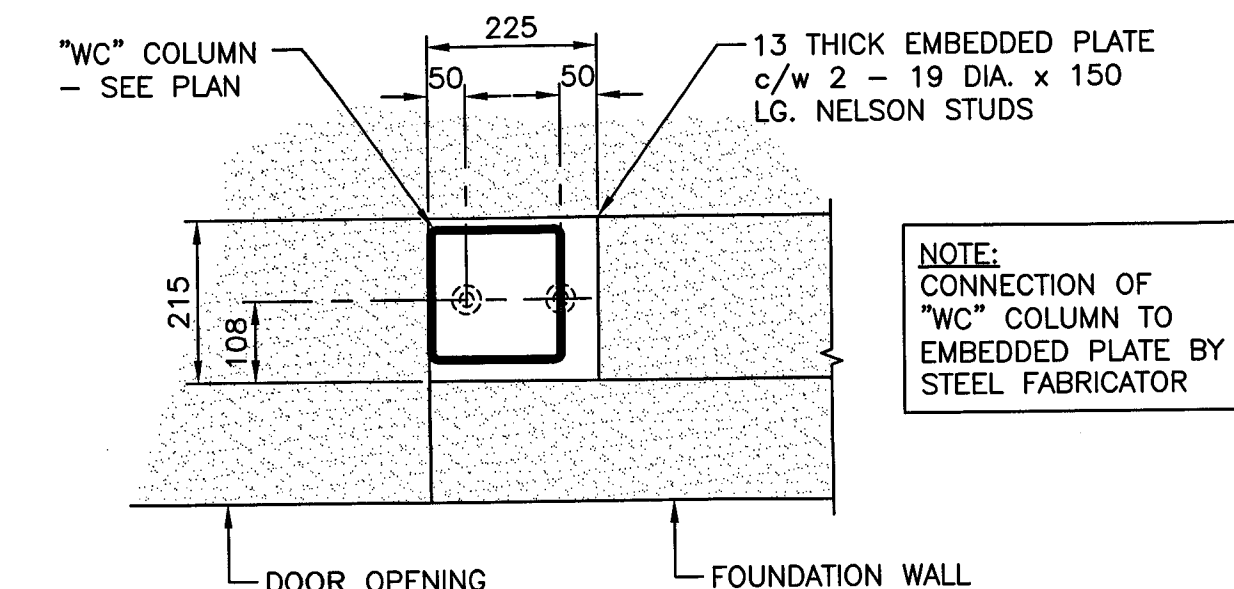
DETAIL - TYPICAL SHEAR TRANSFER ELEMENT
